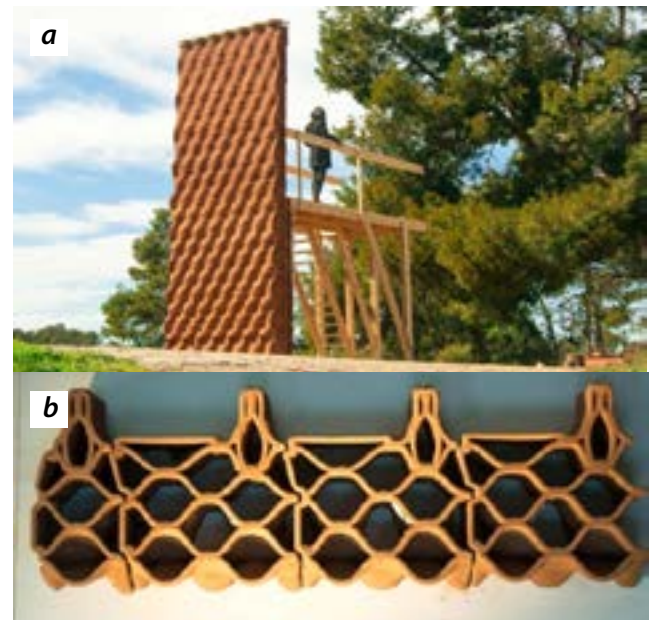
a) Wall built by the Digital Adobe; b) wall modules.
